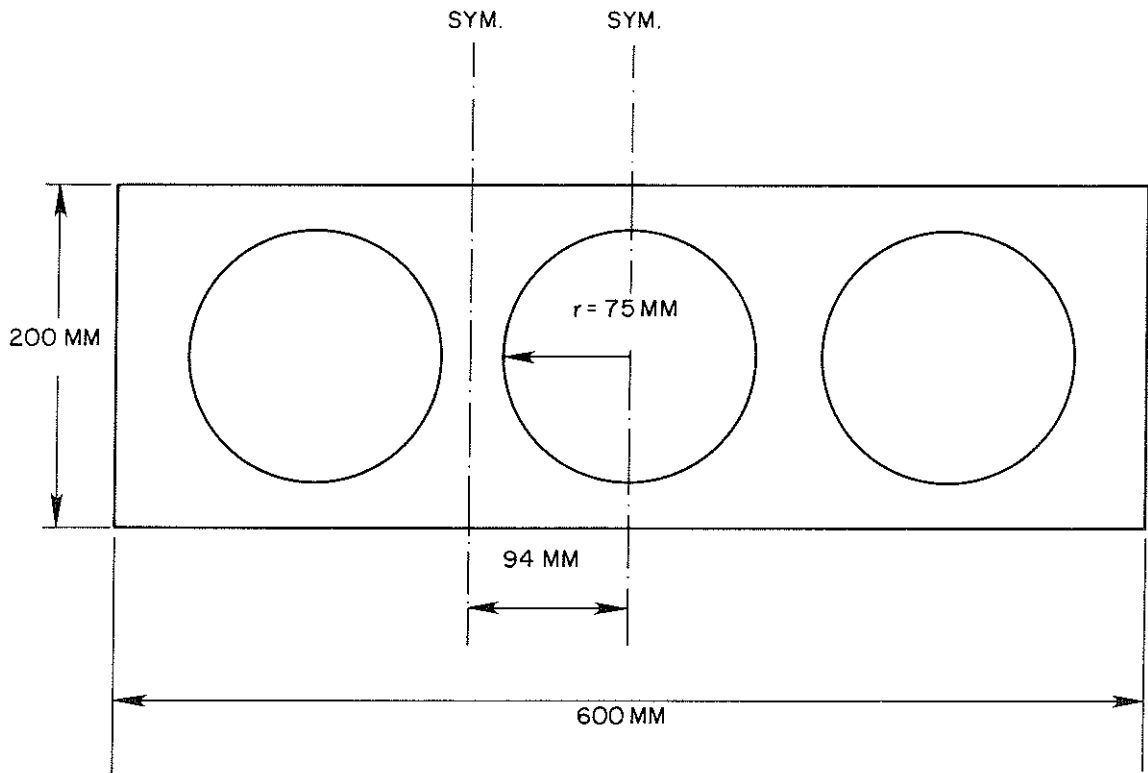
Dimensions of hollow concrete slab element (Abrams)
